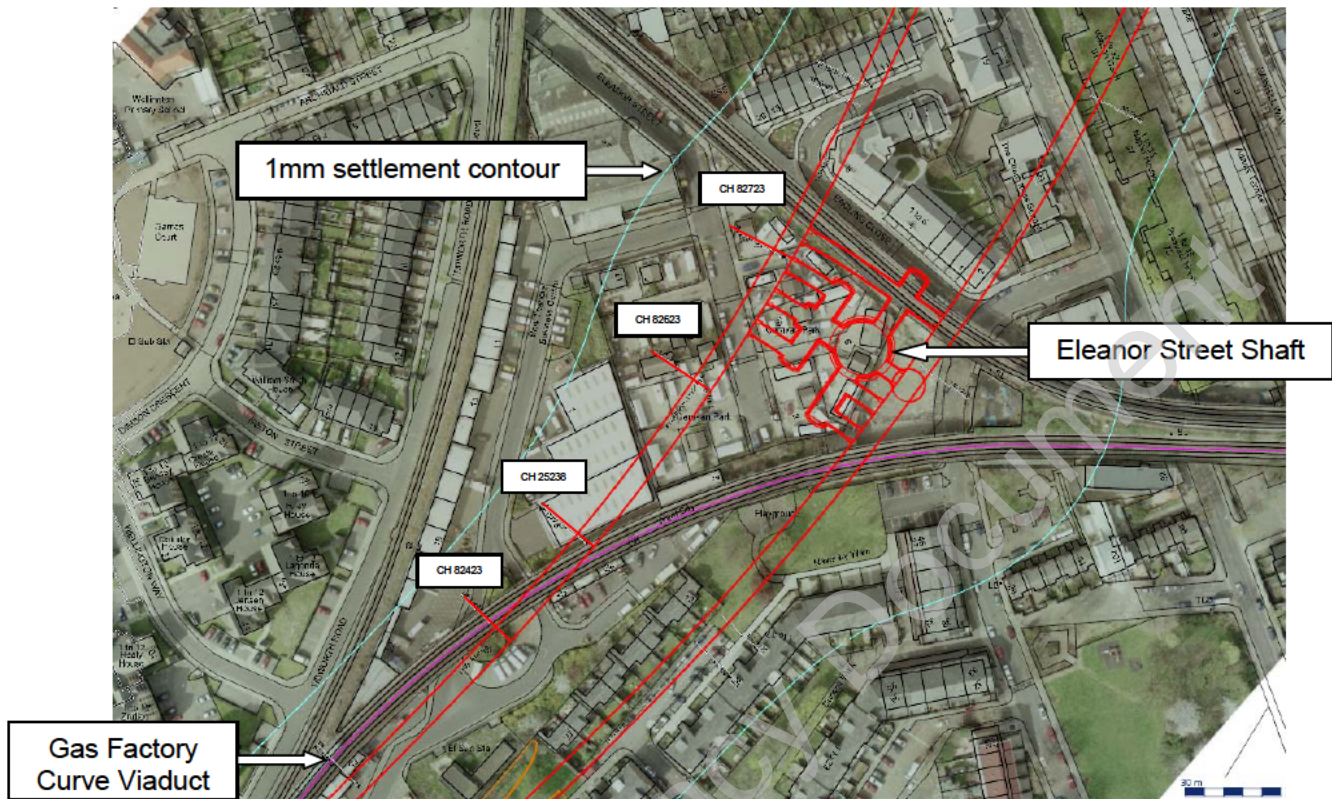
Location plan for interface between Crossrail running tunnels and Network Rail FSS1 Gas Factory Curve Viaduct – NR/19c
